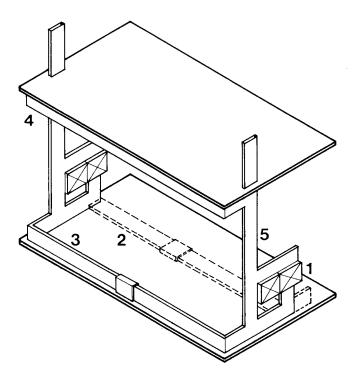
Trunking fixed above door level with conduits on wall surfaces leading to light switches and hight fittings. Lomé Hospital, Togo; Architect: G. LIPPSMEIER.
